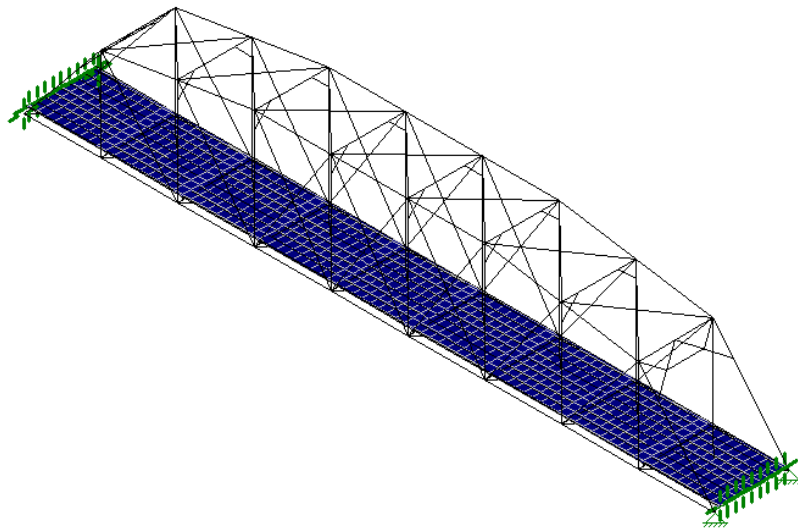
Prowers Bridge. Skeleton model with stringers and deck.
